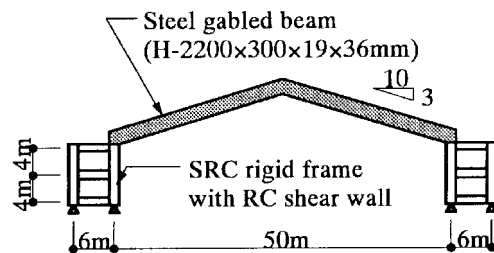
Long span gabled roof structure supported by rigid frames with shear walls
